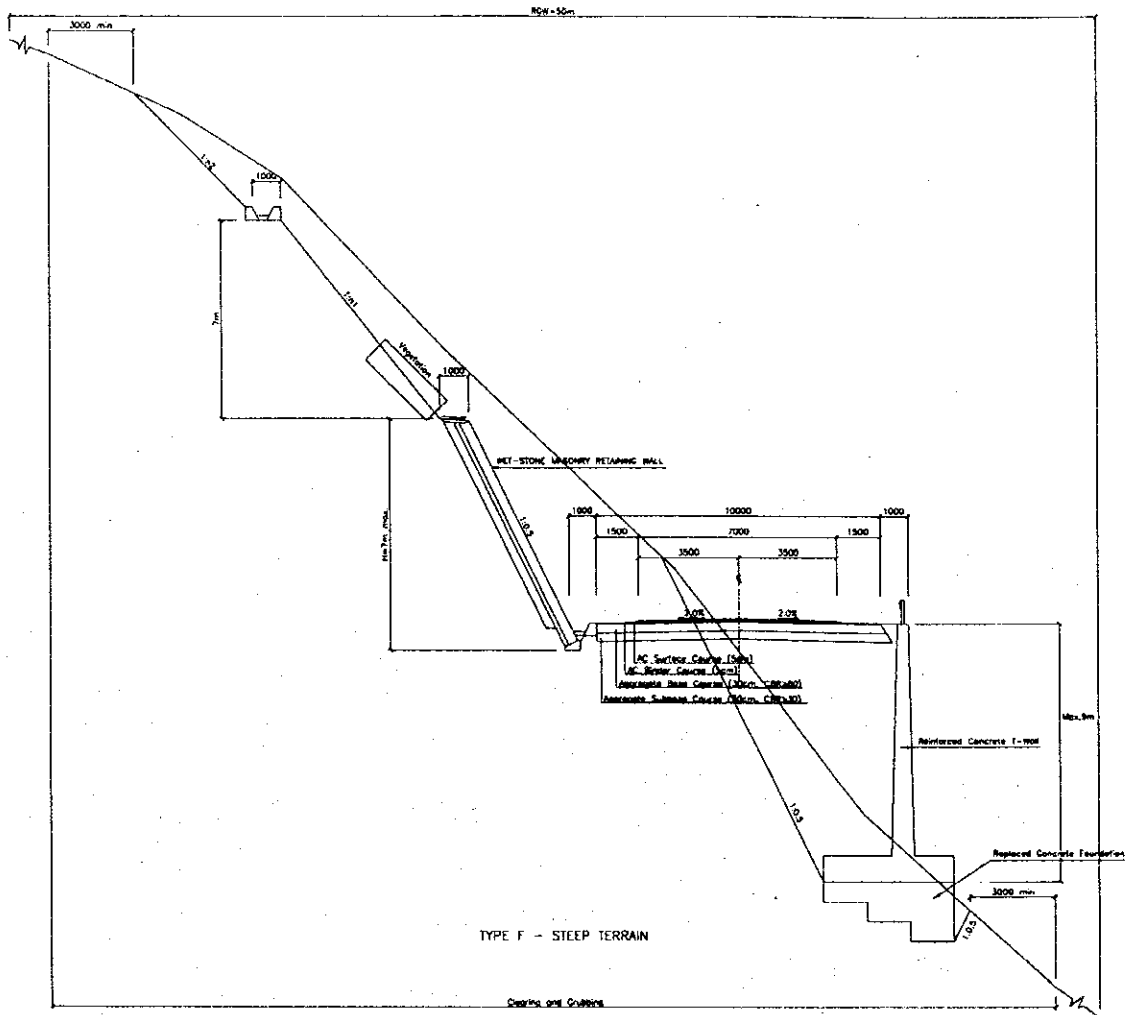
(2/2) Typical Cross Sections on Roadway
